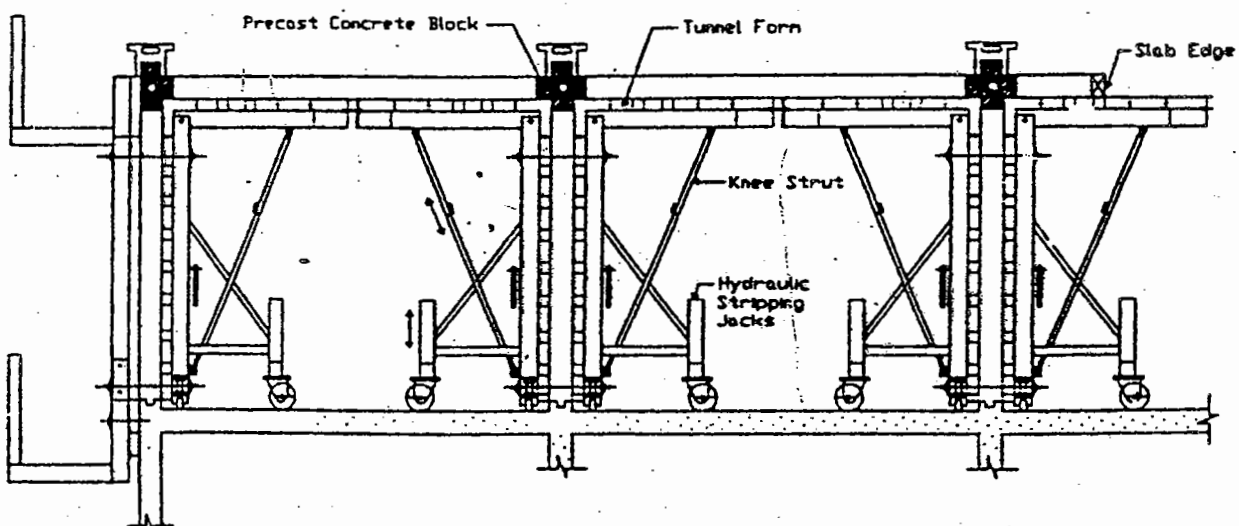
Tunnel formwork system. (Courtesy of Symons Corp.)
